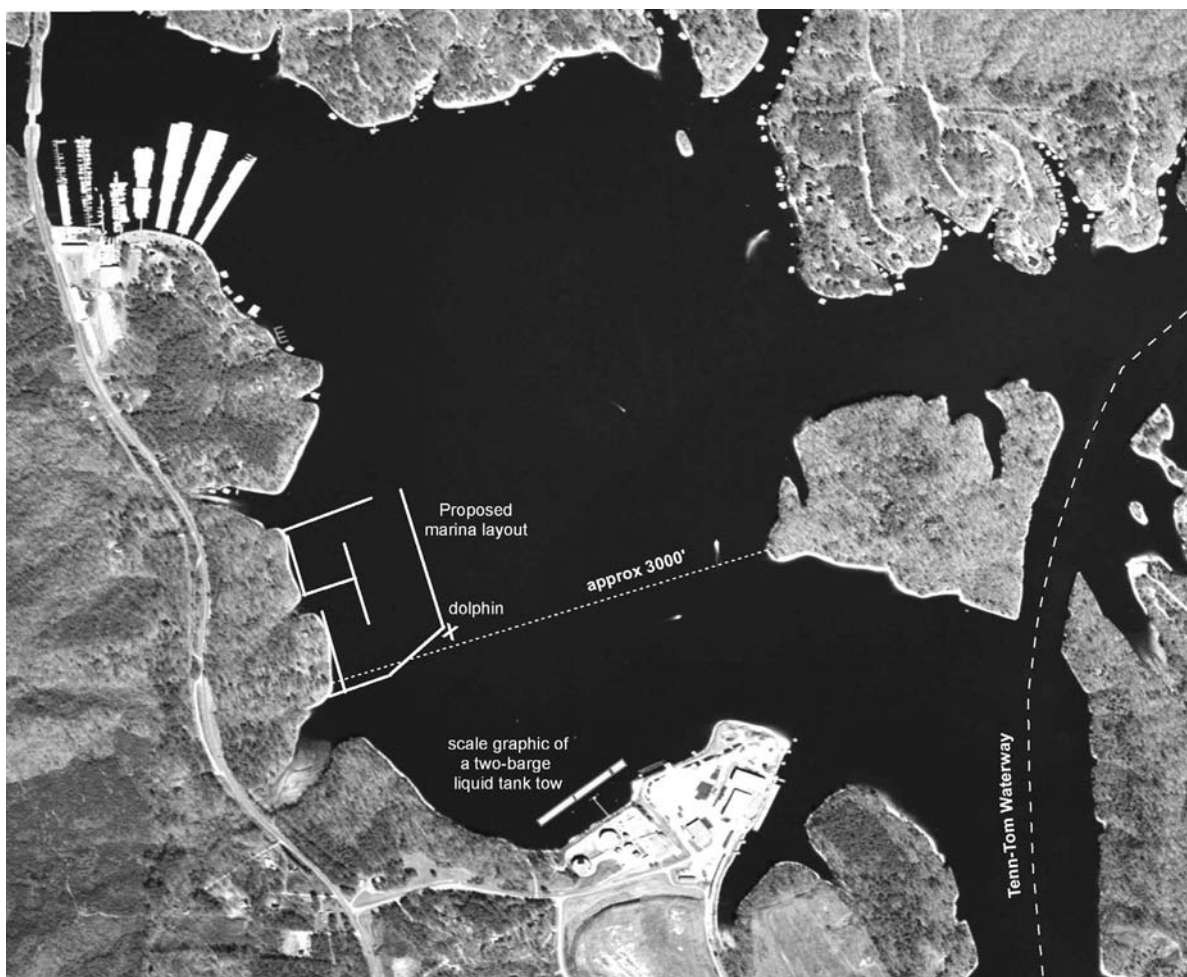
Proposed Marina Layout (Scale Drawing)
